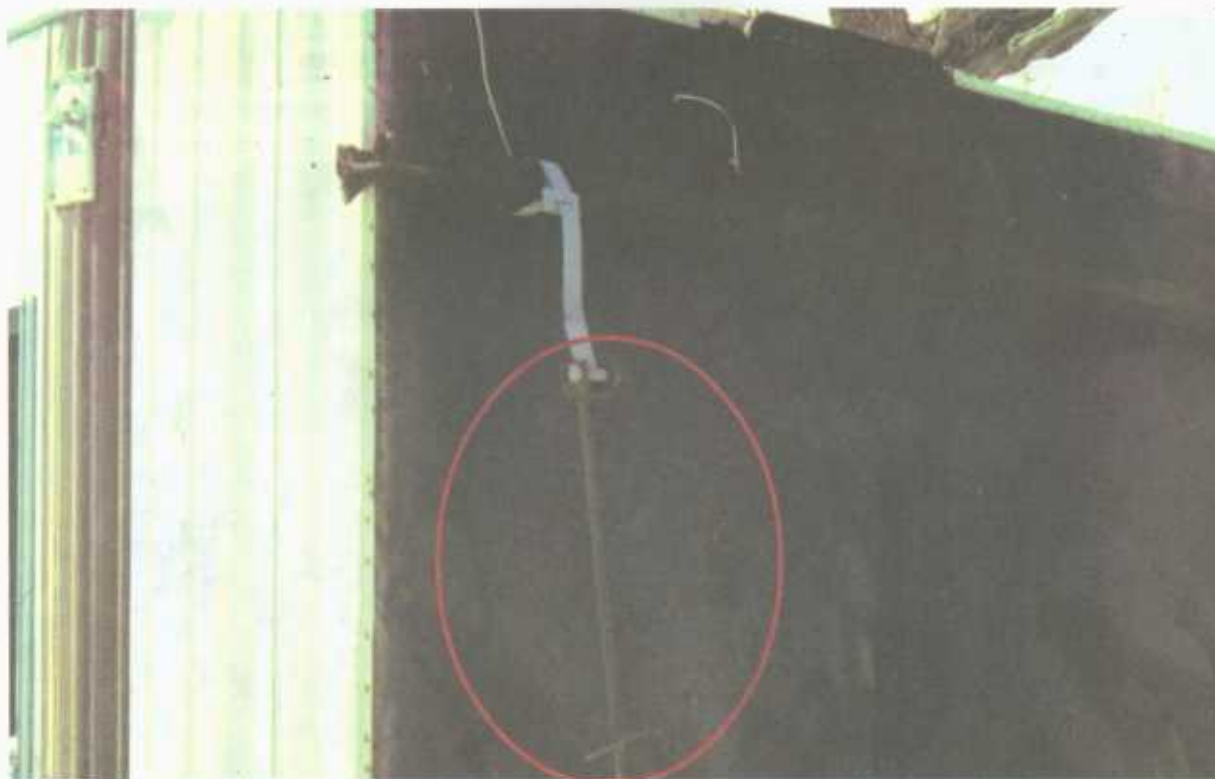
Permanently installed RV overturned as a result of anchor pullout. Anchor (circled) is 2 feet long.
